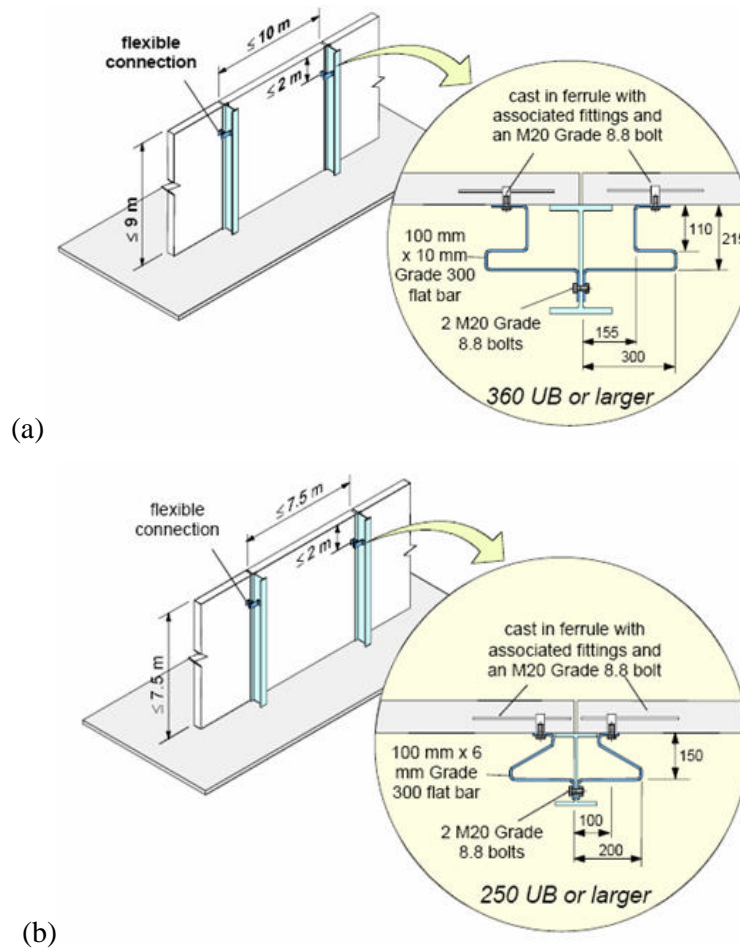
Details of flexible connections (Bennetts and Poh, 2000)
